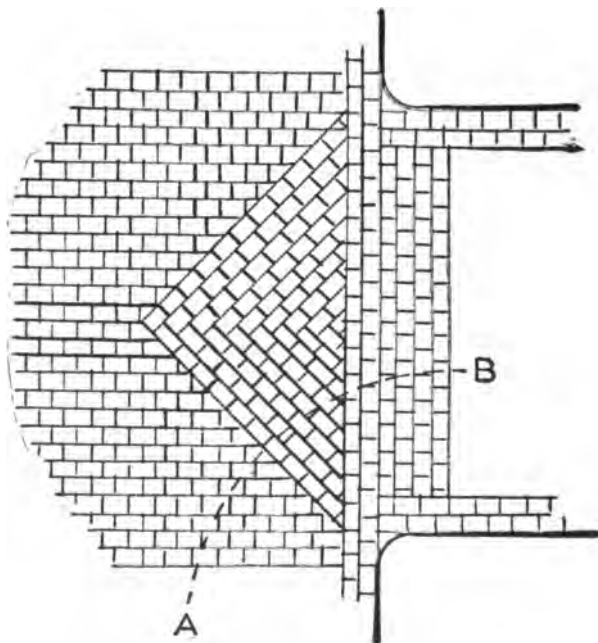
PLAN OF STREET PAVED WITH WOOD BLOCKS.
